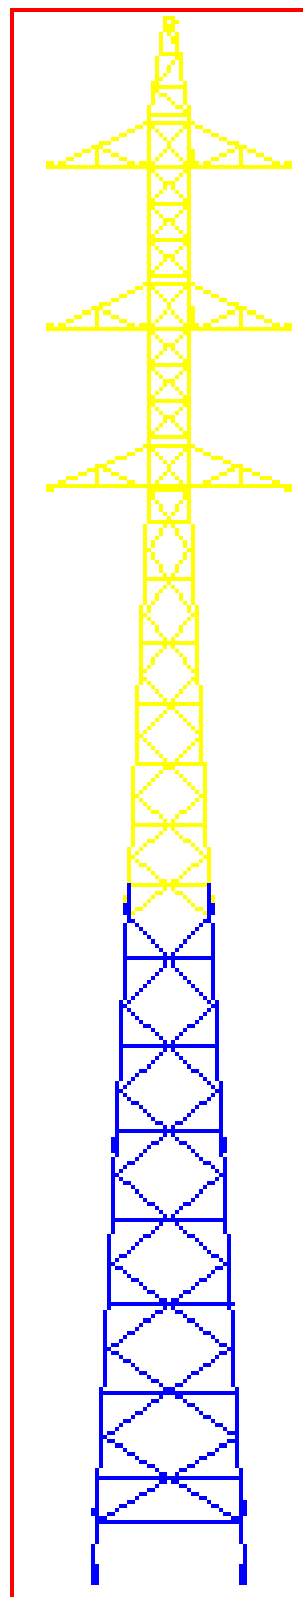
Schematic Drawing of 132kV Double Circuit Tower
